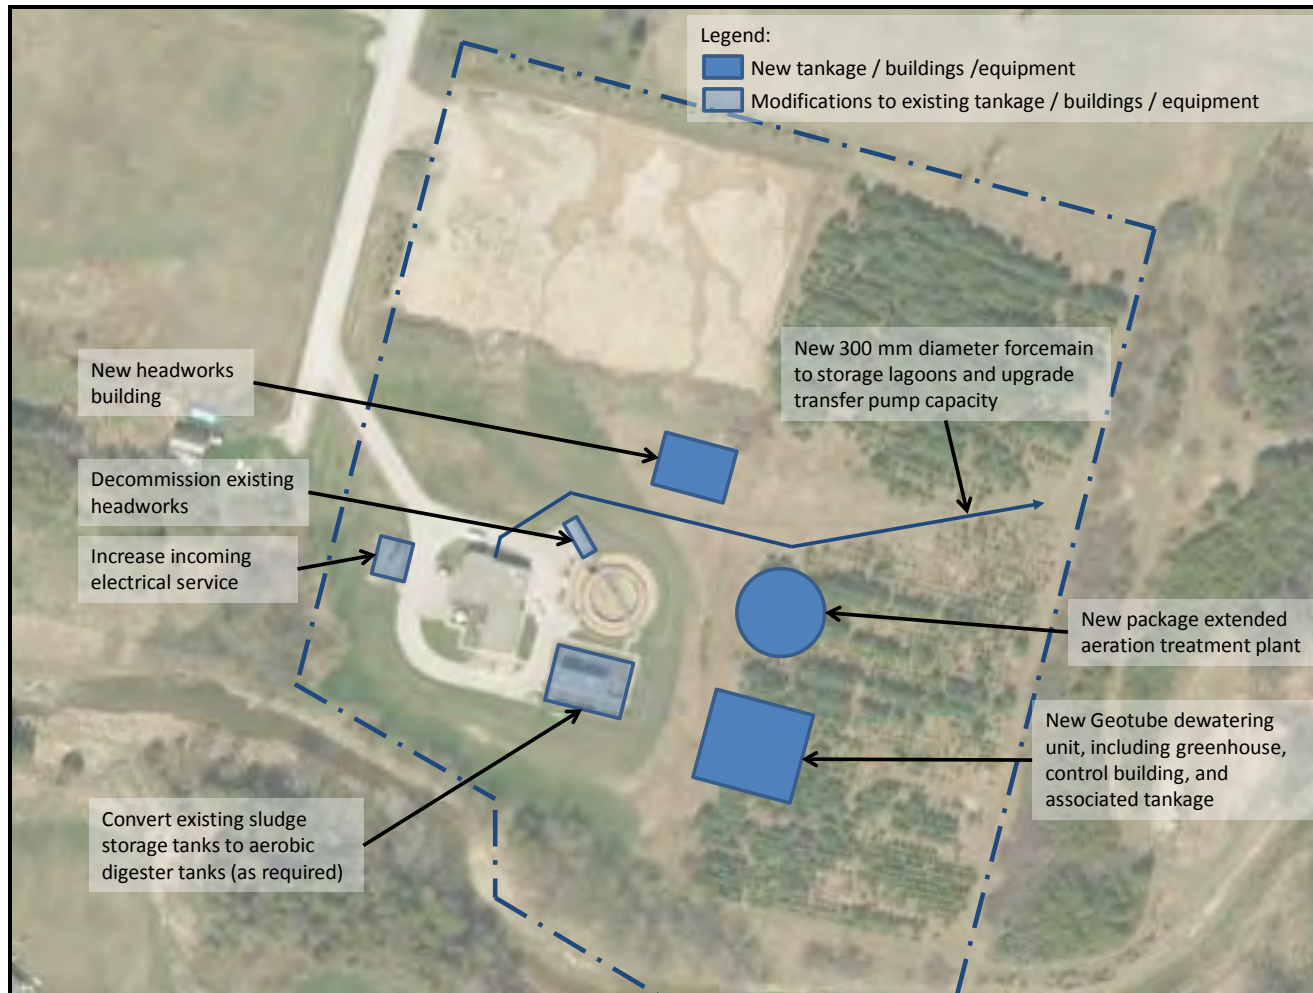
Option 2B - Twin Existing EA Plant with new Geotextile Dewatering and Cake Storage
